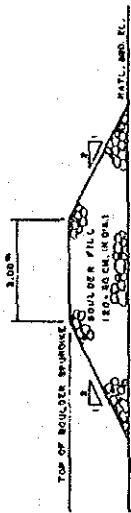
TYPICAL CROSS SECTIONS OF EXISTING DIKE (3/4)
